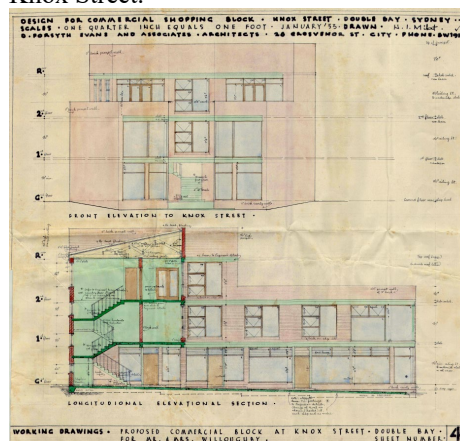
Evan's Knox Street elevation and section of the proposed "shopping block" at No 21 Bay Street.
